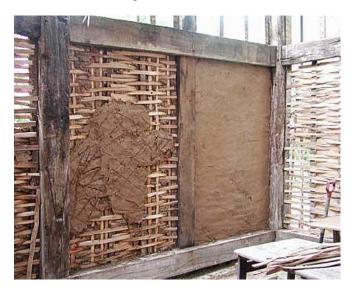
Timber-framed building with panels at various stages of wattle & daub infill [17]
